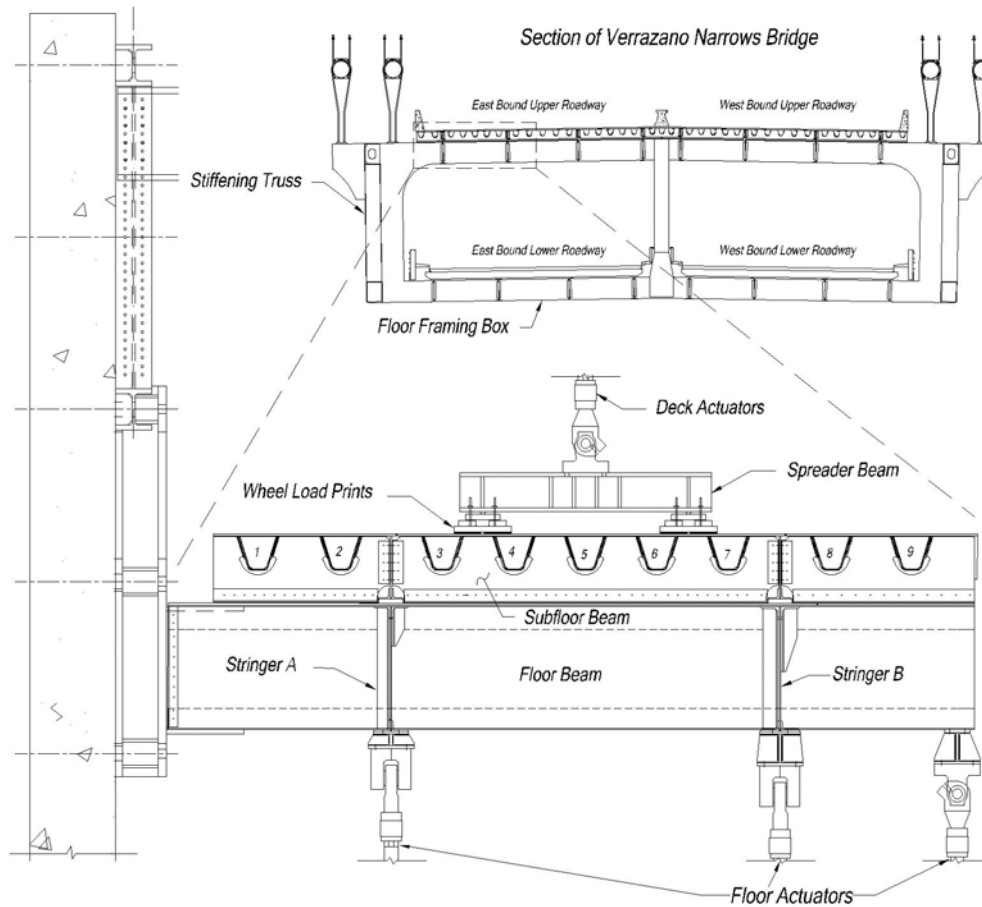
Cross-section of Full-scale Setup in Laboratory for Verrazano Narrows Bridge
